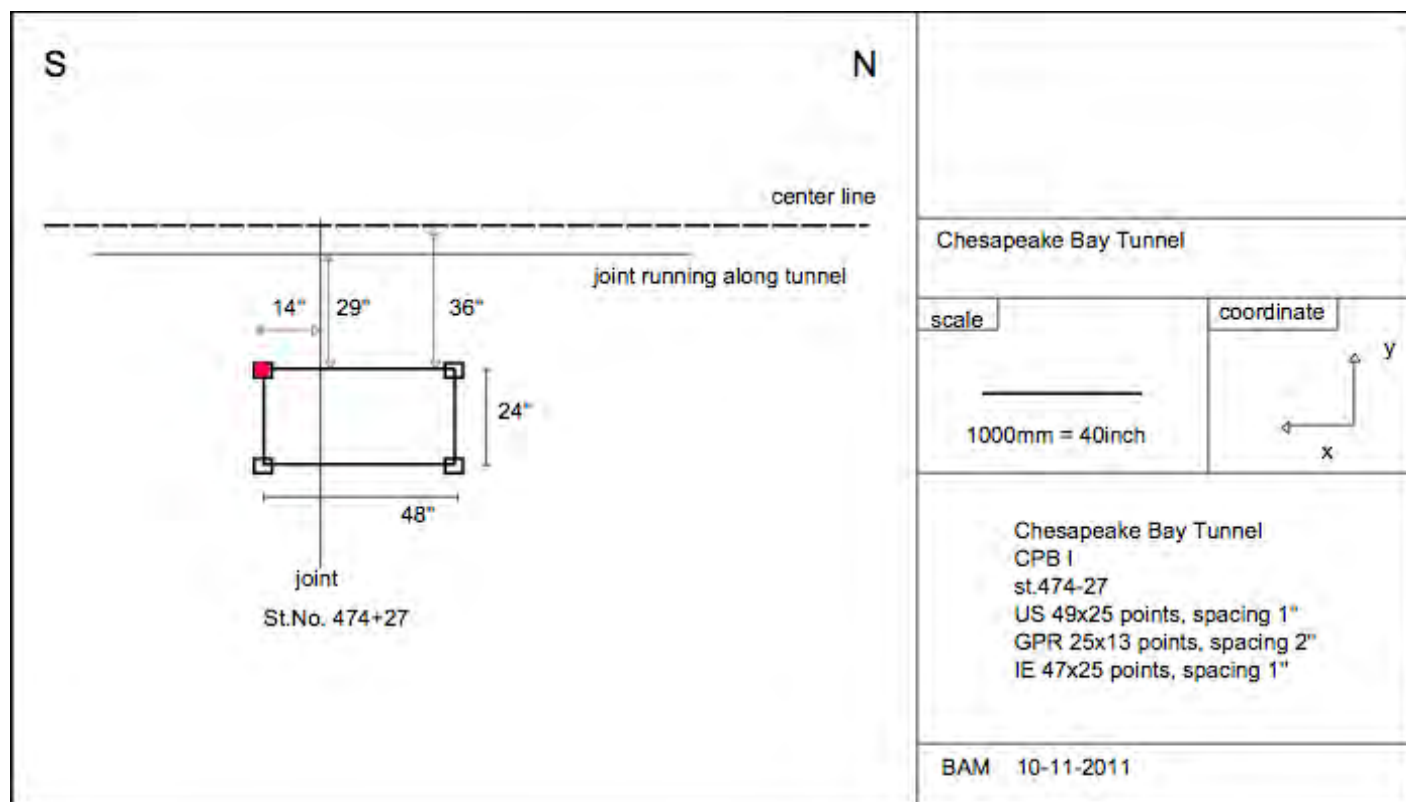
Sketch of test area CPB1, Station 474-27, Chesapeake Channel Tunnel.
